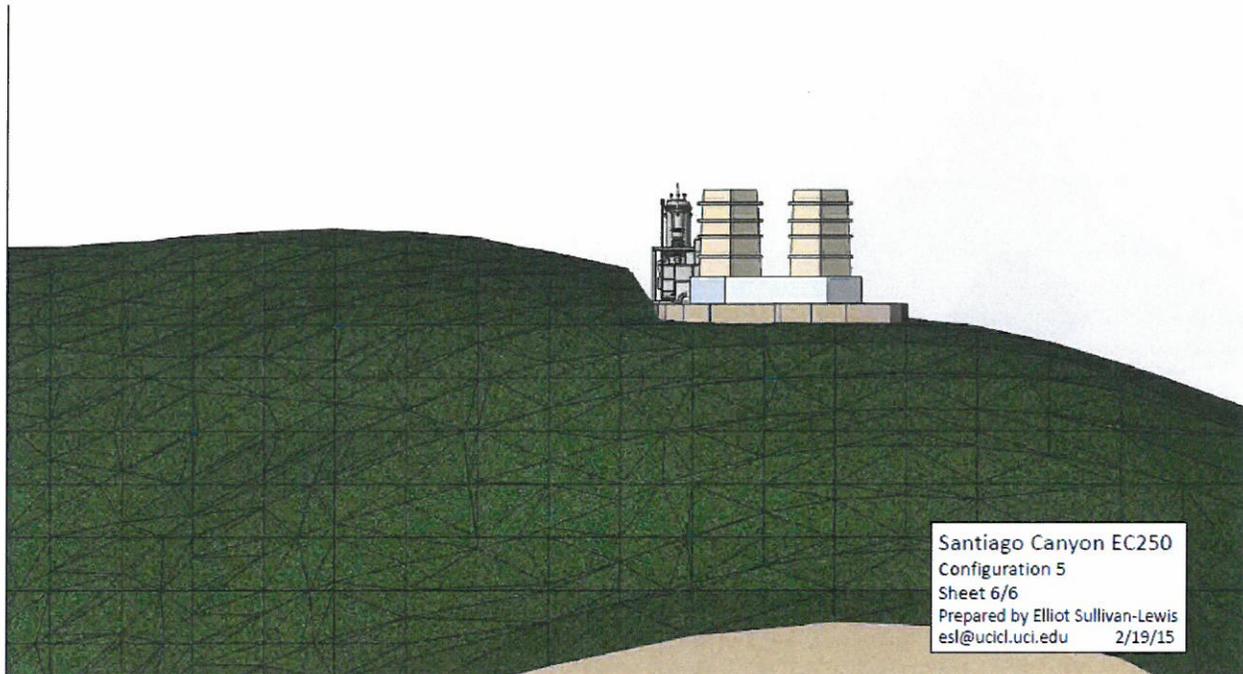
Equipment Layout Adjacent to Existing Flare Station
